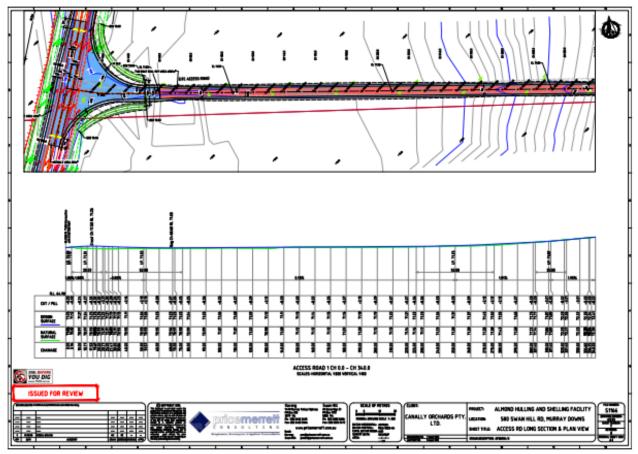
Proposed development Site Plan (Price Merrett Consulting, 2024)
